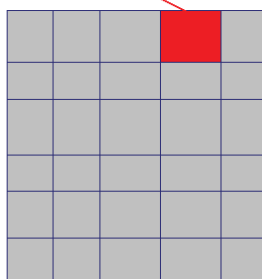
Elevation view of Group 1205 indicating Element 15135, looking East.
